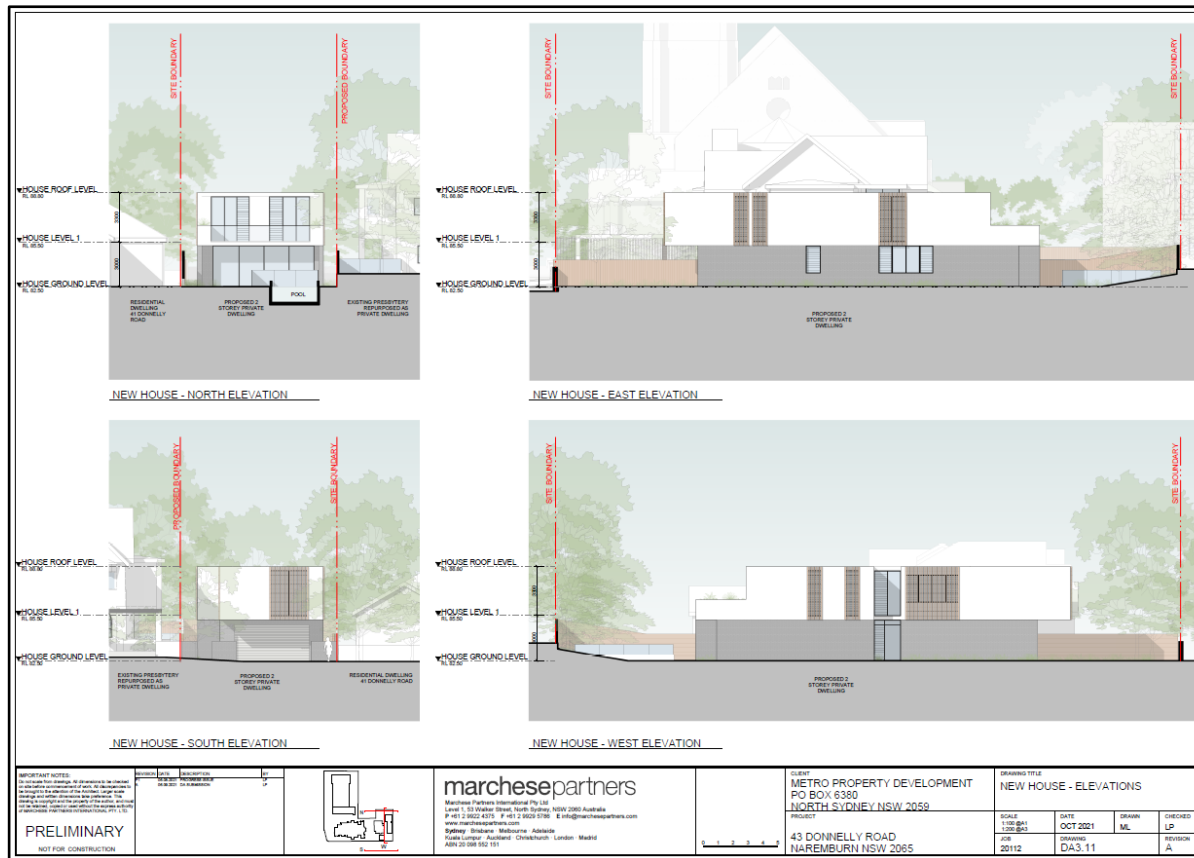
Proposed elevation of the new dwelling next to the existing presbytery.
